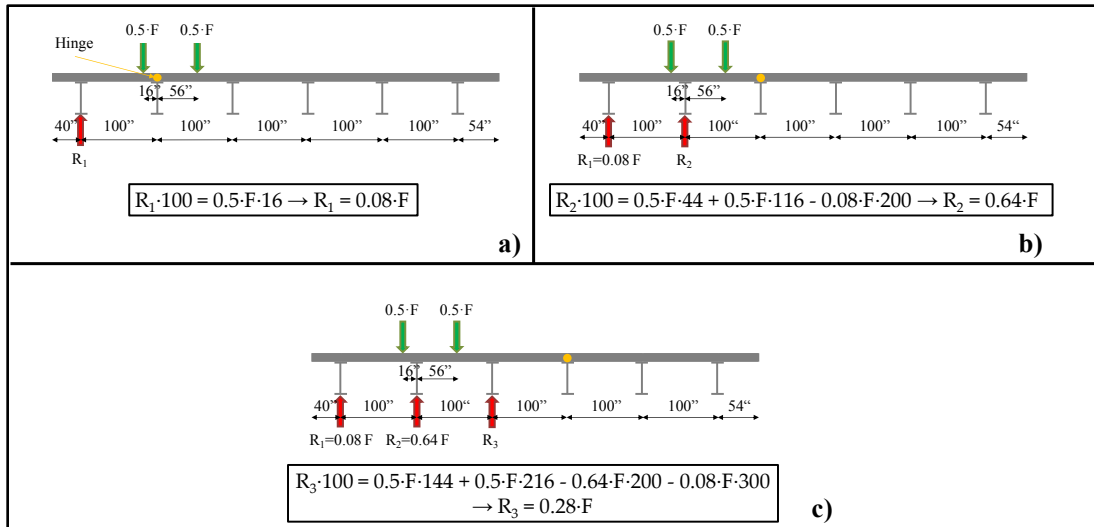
Lever rule calculation of the Bridge C reactions on Girder 1 (a), Girder 2 (b), and Girder 3 (c)
